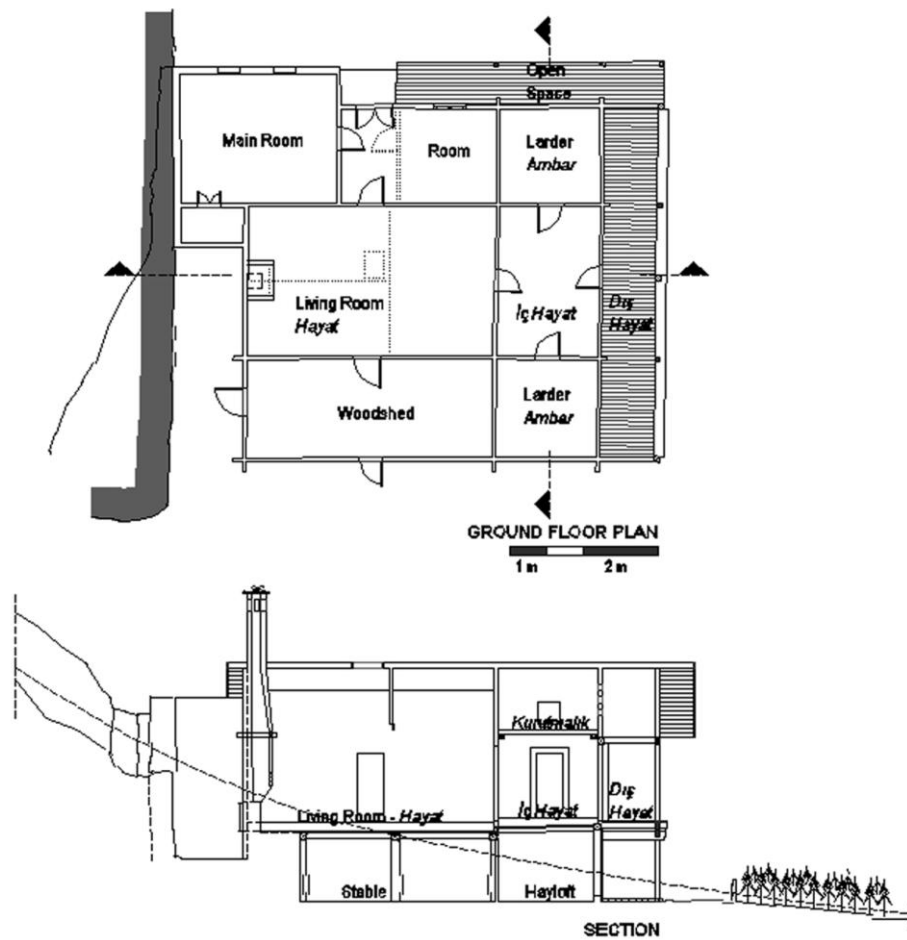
, Ground Floor Plan and Longitudinal Section of a Vernacular *Uzungöl* House³⁹
